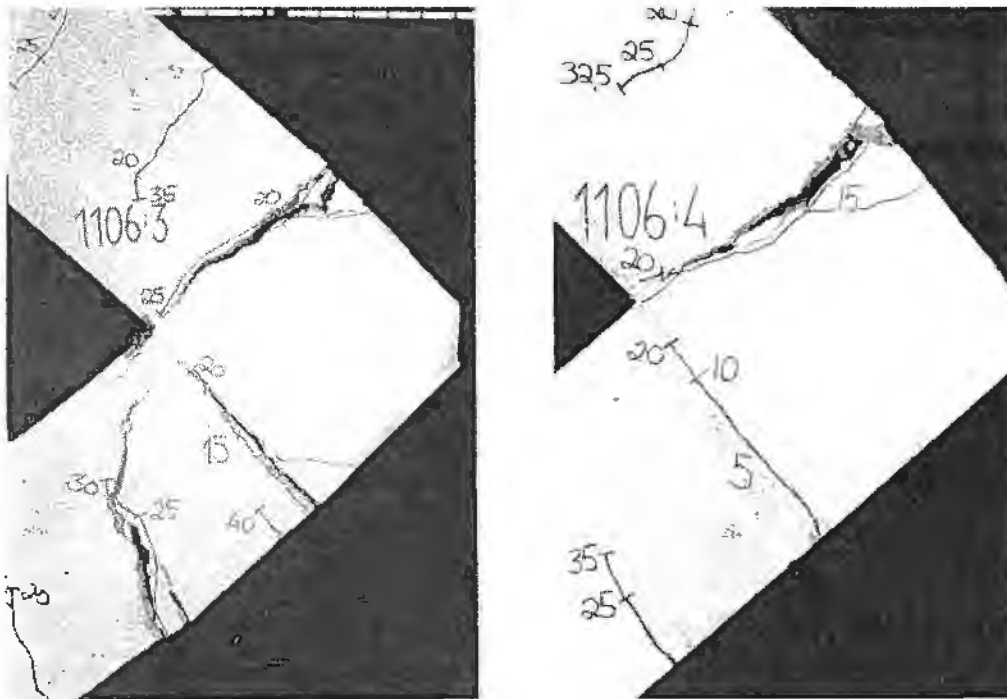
Specimens with low reinforcement ratio at maximum deformations. The specimen to the left has conventional reinforcement and the specimen to the right has the new detailing.
